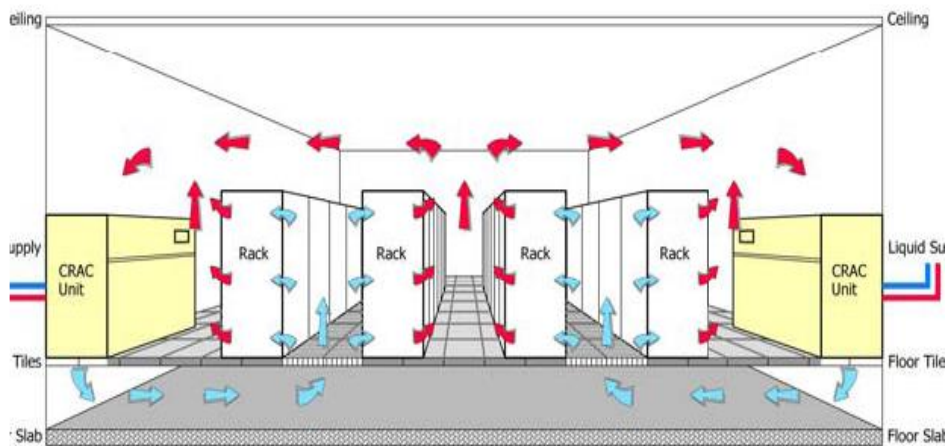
Raised floor implementation using baffles to limit hot-aisle/cold-aisle “mixing.”
